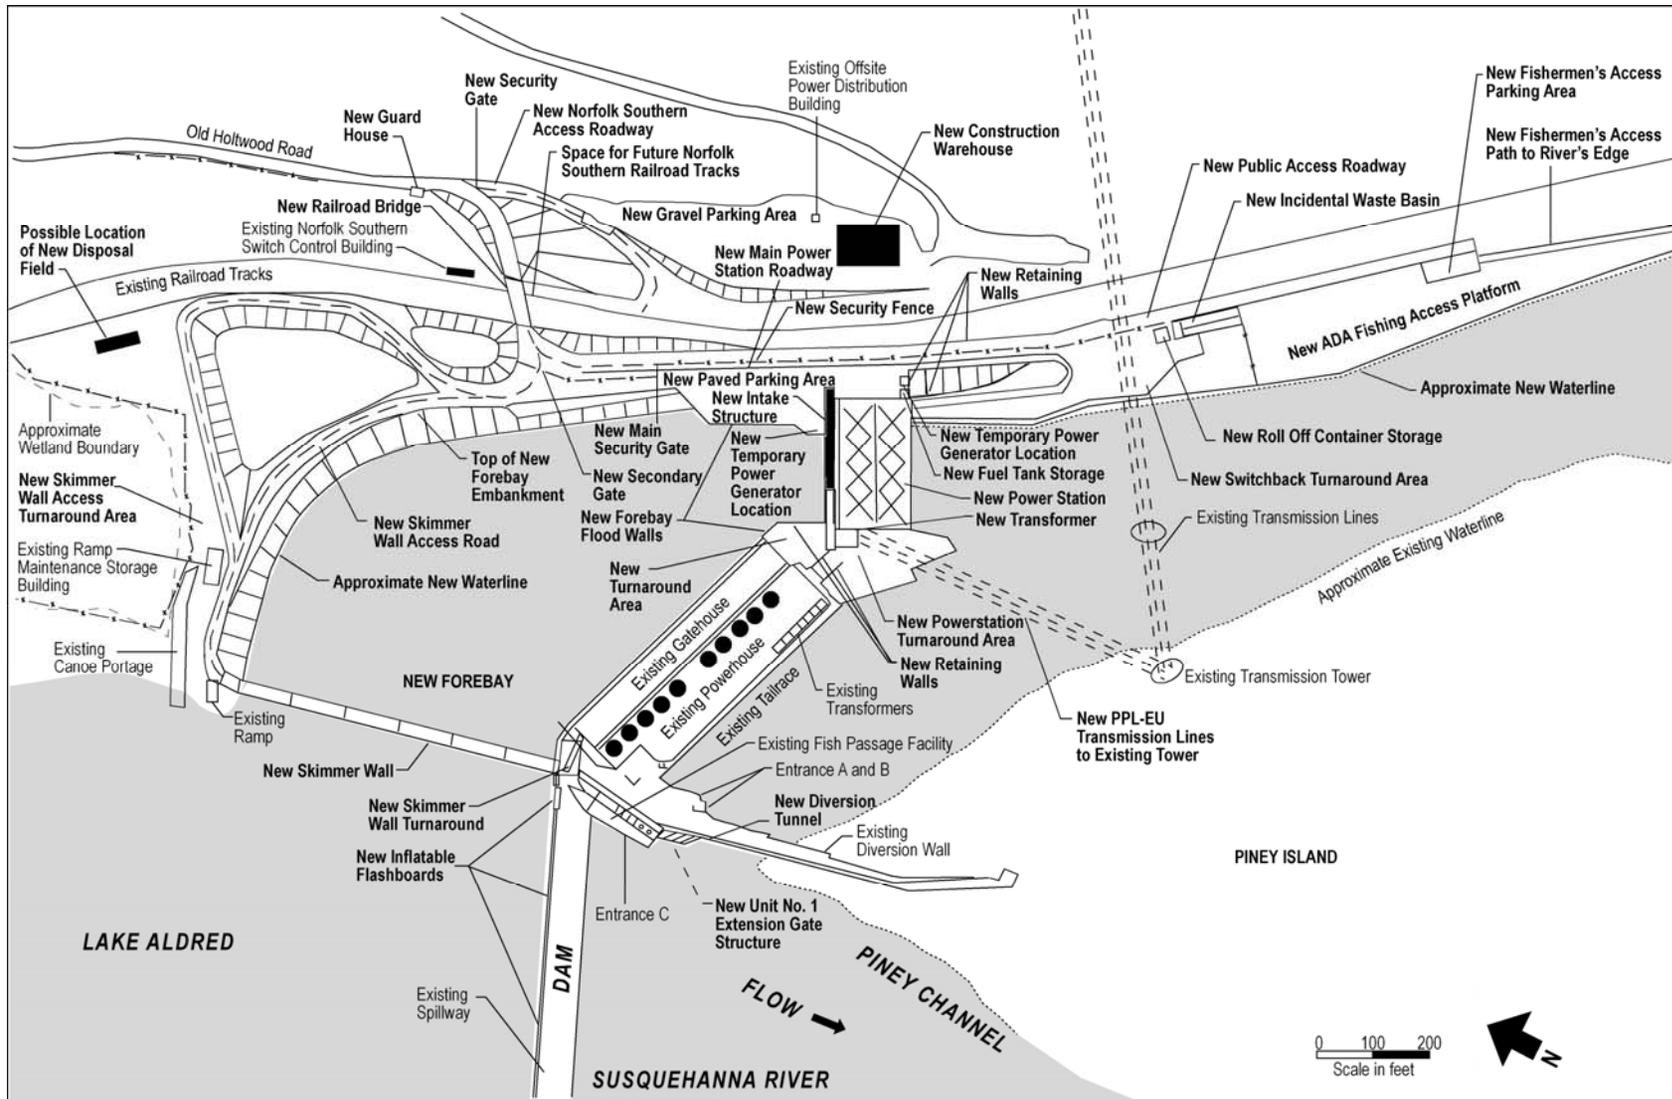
Detailed view of proposed and existing facilities at the Holtwood Project. (Source: PPL, 2007a, as modified by staff)
